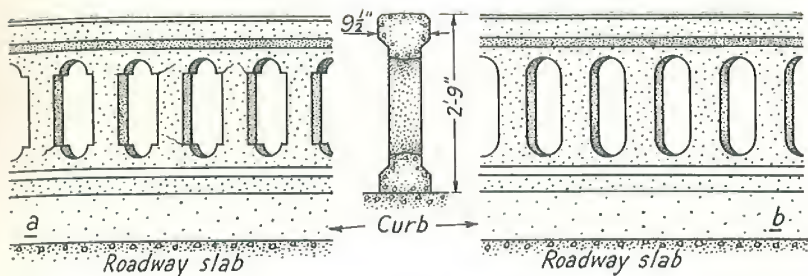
Handrailing with re-entrant angles may develop cracks as indicated in type *a*. It is better to make the apertures rounded as shown in type *b*.
